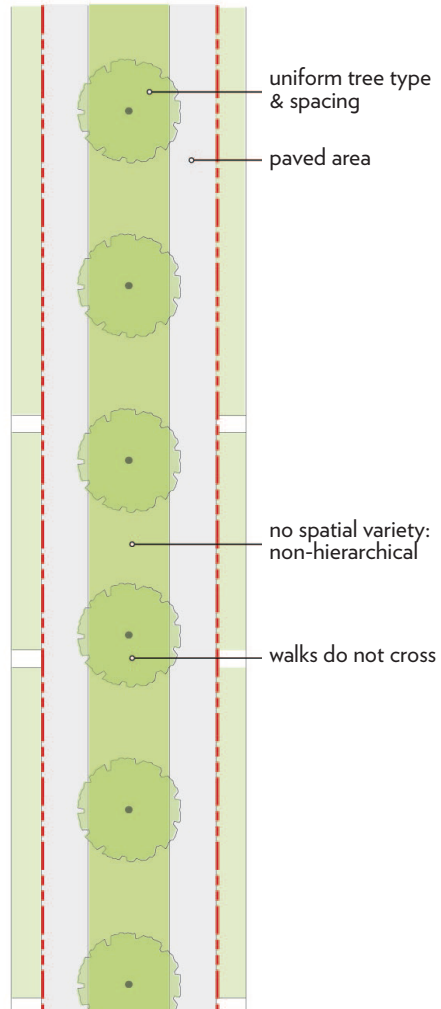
Private Common Open Space: Plant diversity and walkways
